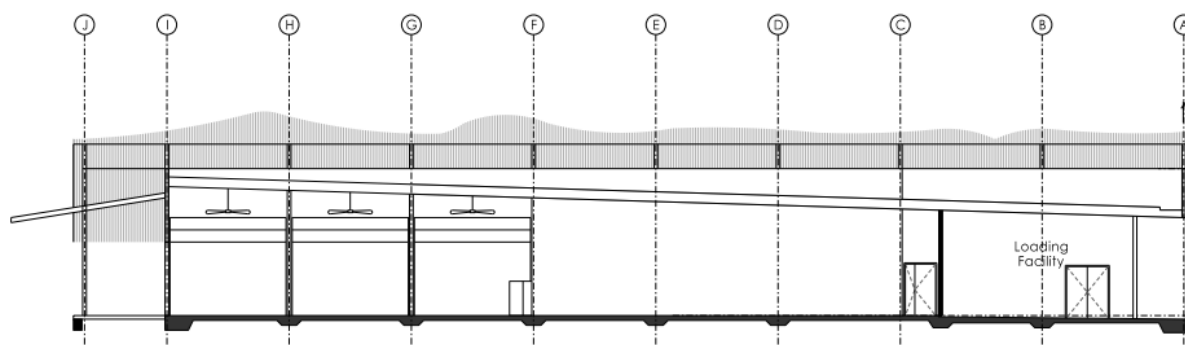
Cross Ventilation to Building 2 (Restaurant) with Ceiling Fans
